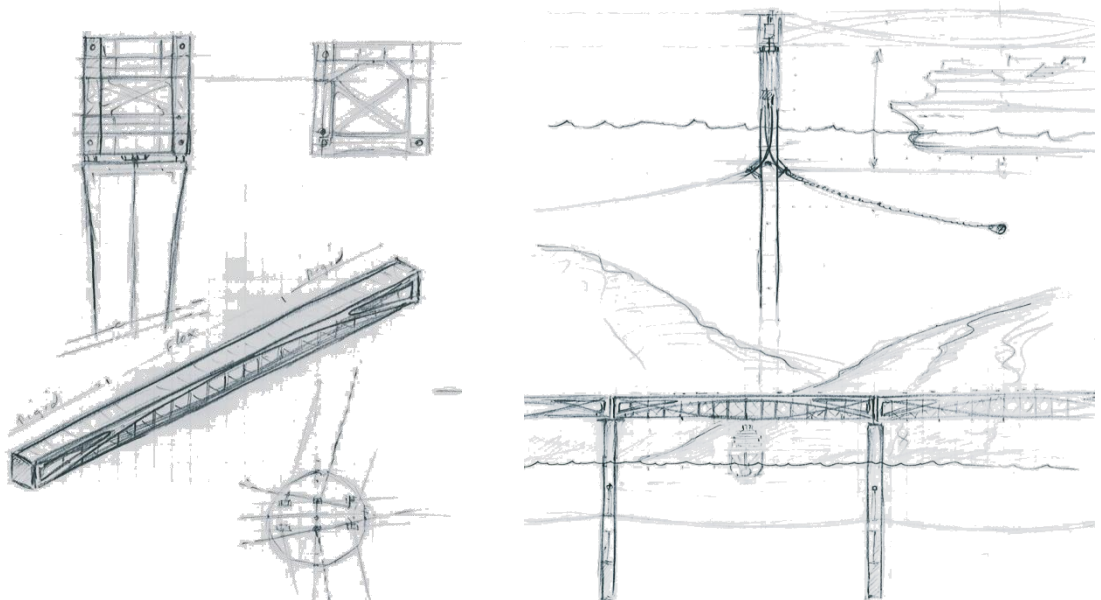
SUGGESTED LATTICE GIRDER BRIDGE WITH TWO HIDDEN ARCHES
